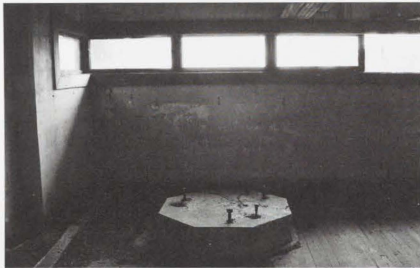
The searchlight powerhouse is a World War I vintage building constructed of concrete and expanded metal lath panels. It provided power to the searchlight station on Chimook Point. It is visible in construction photos of the casemate. The building is in a serious state of deterioration.
